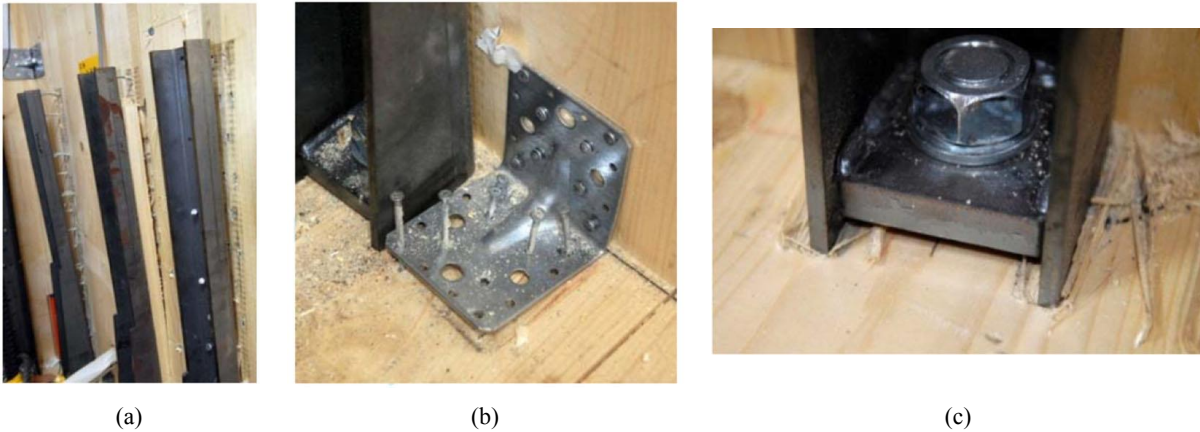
Failure modes observed in SOFIE project: (a) out-of-plane bending (b) pulling-out of nails (c) connector embedment [2.19]
